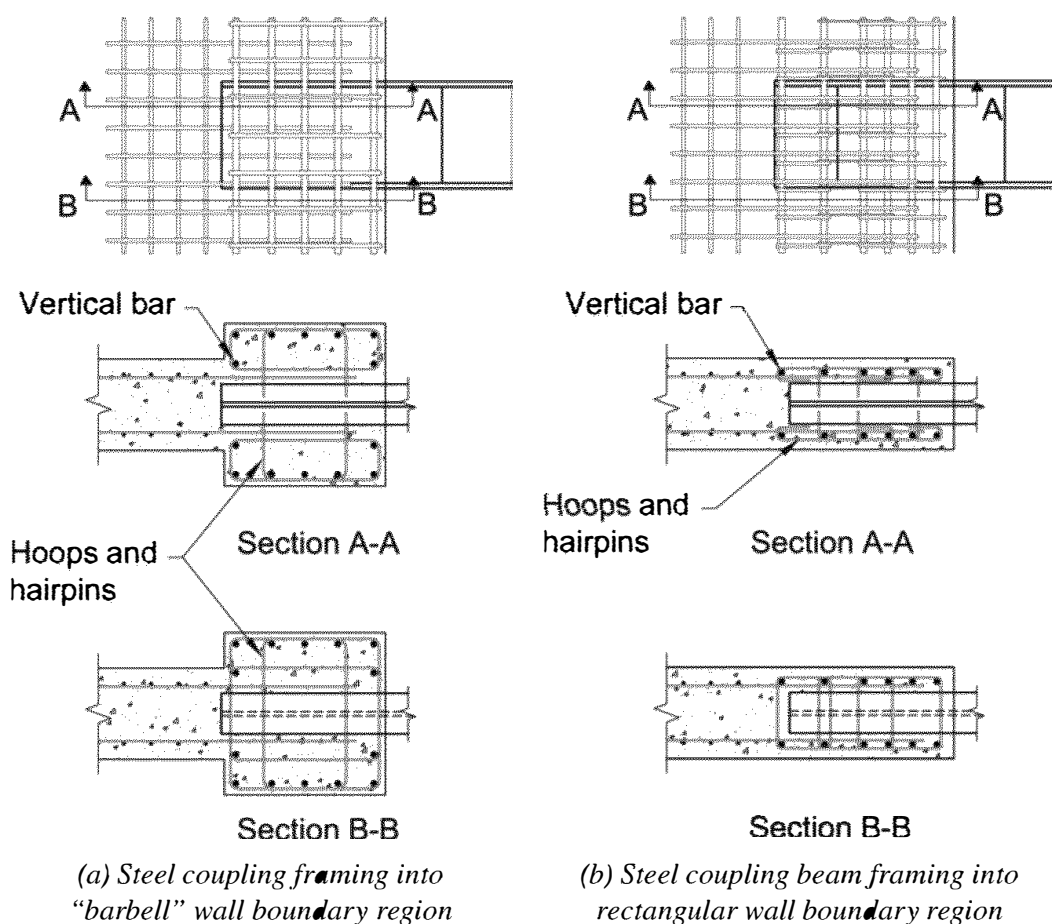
Example details of a steel coupling beam embedded in reinforced concrete wall.
